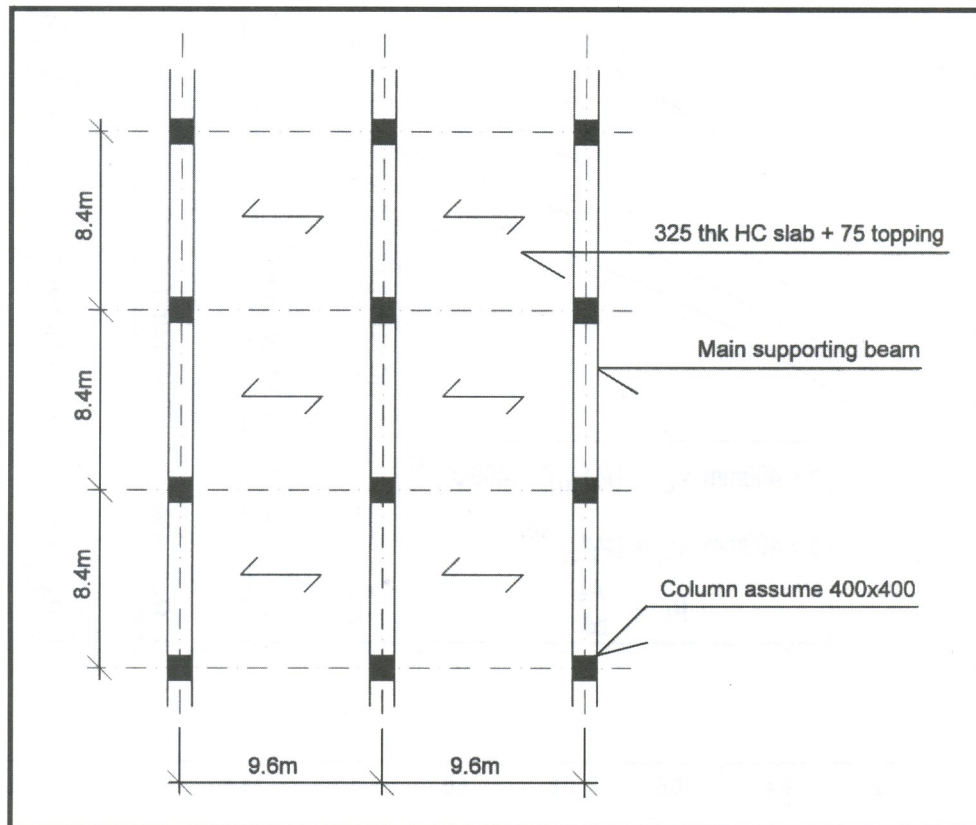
Typical Floor Plan For Precast Beam Design For Design Examples 3 to 6.
